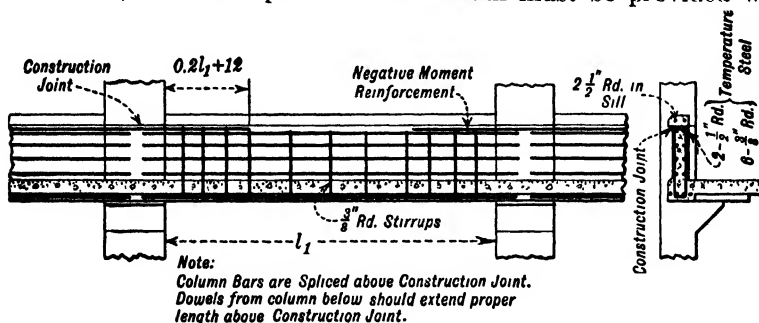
Concrete Spandrel Built Monolithic with Slab and Columns. (See p. 382.)
